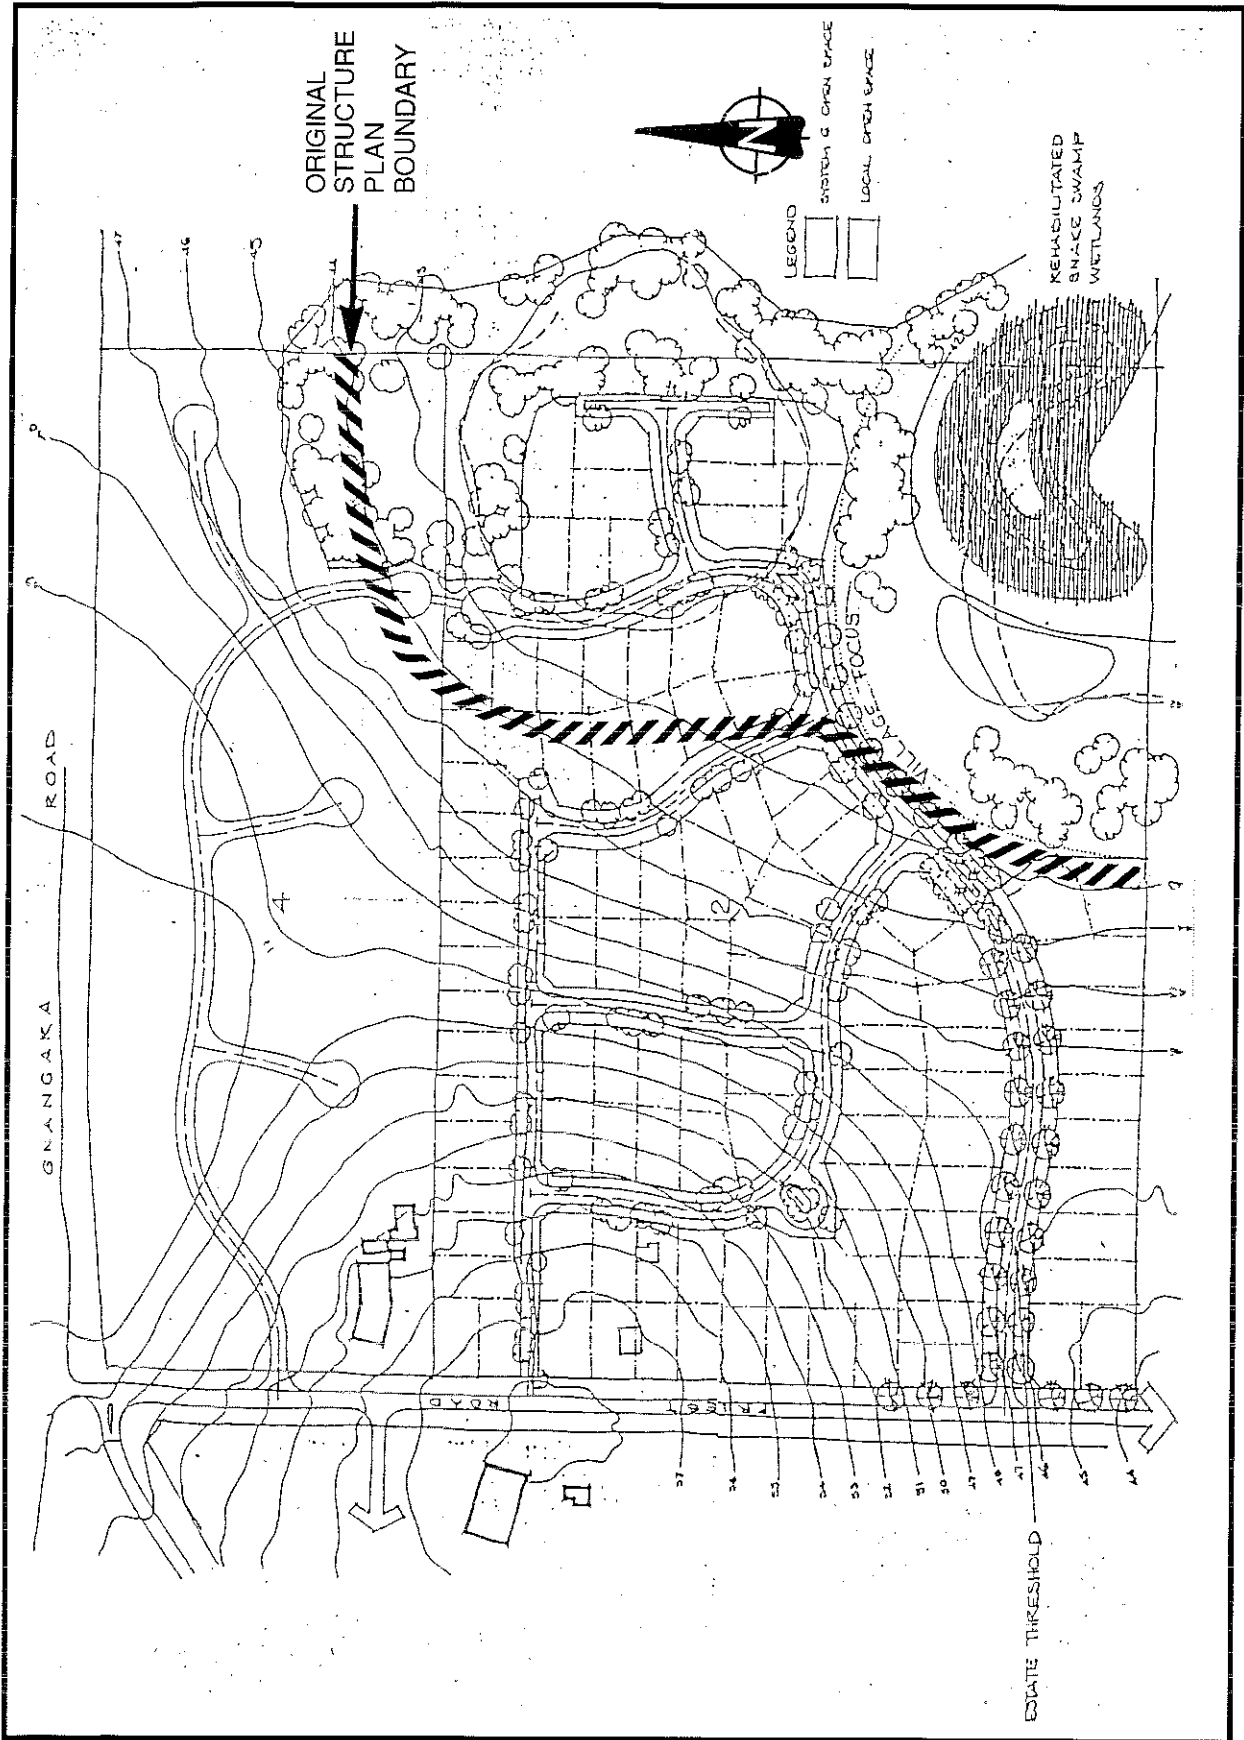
Proposed concept plan showing original Public Open Space boundary.
